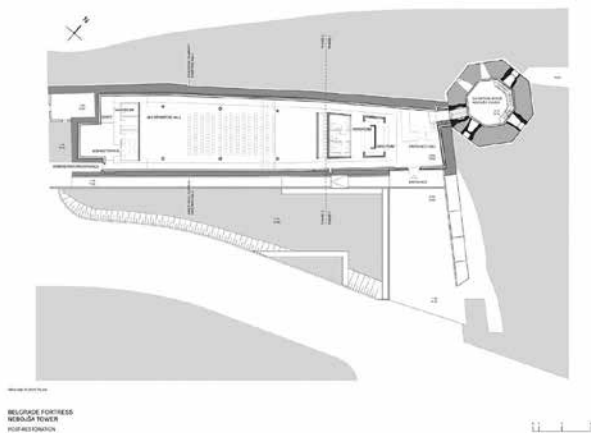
Plan Tower complex with entrance zone, multifunctional hall and exhibition space in Tower. <https://dejanmiljkovic.rs/sr/>
